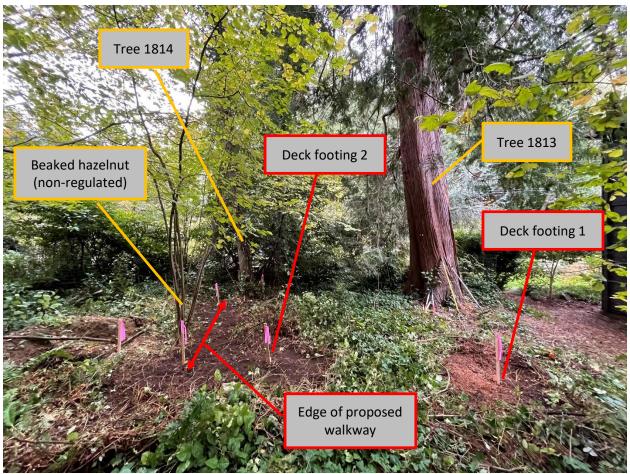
A view of the site prior to air excavation. Locations of impact areas to be assessed are indicated.
